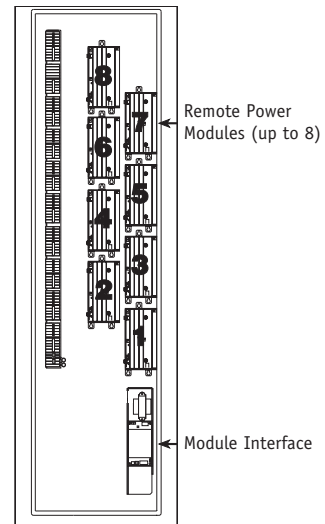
HWI-MI-120 Mounted in a HWI-PNL-8 Enclosure
